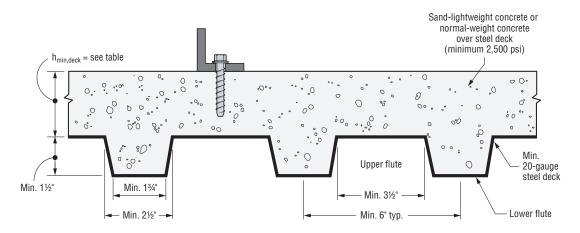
Installation of ¼"-, %"- and ½"-Diameter Anchors in the Topside of Concrete over Steel Deck
